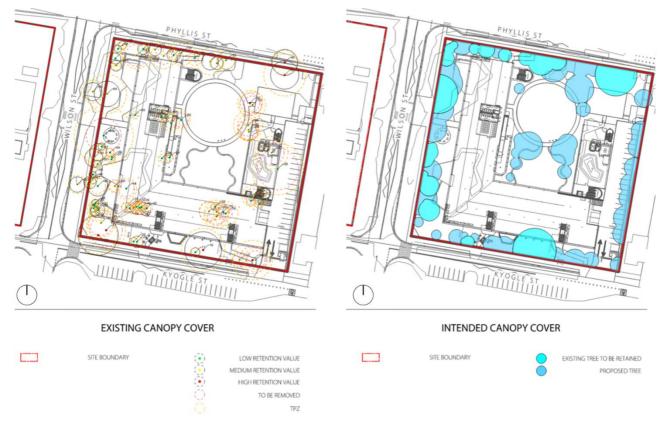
Existing and proposed canopy cover (Source: Terras Landscape Architects)
